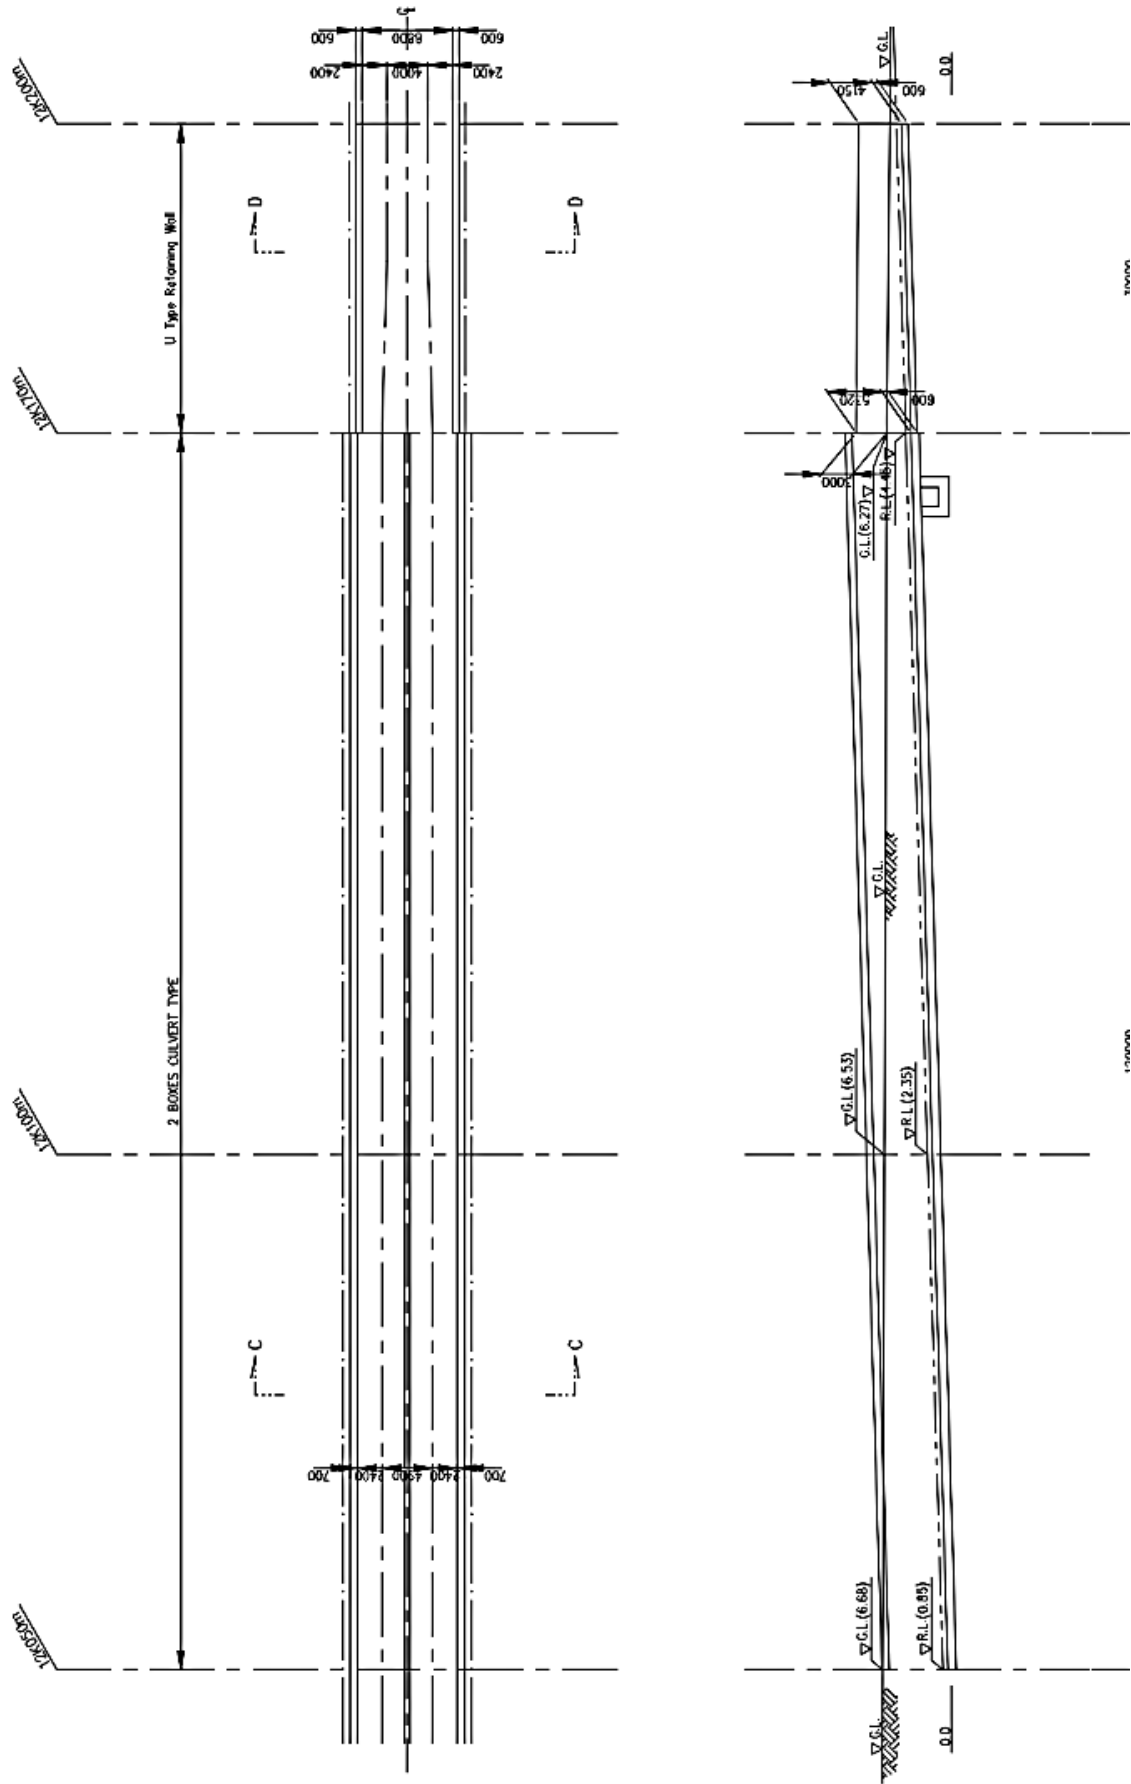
Future Park Station - Bashun Station [Purbachal Sector 7 Station] to [Purbachal Ea Station] dhara Station (Transition Section) Plan and Profiles (2)
